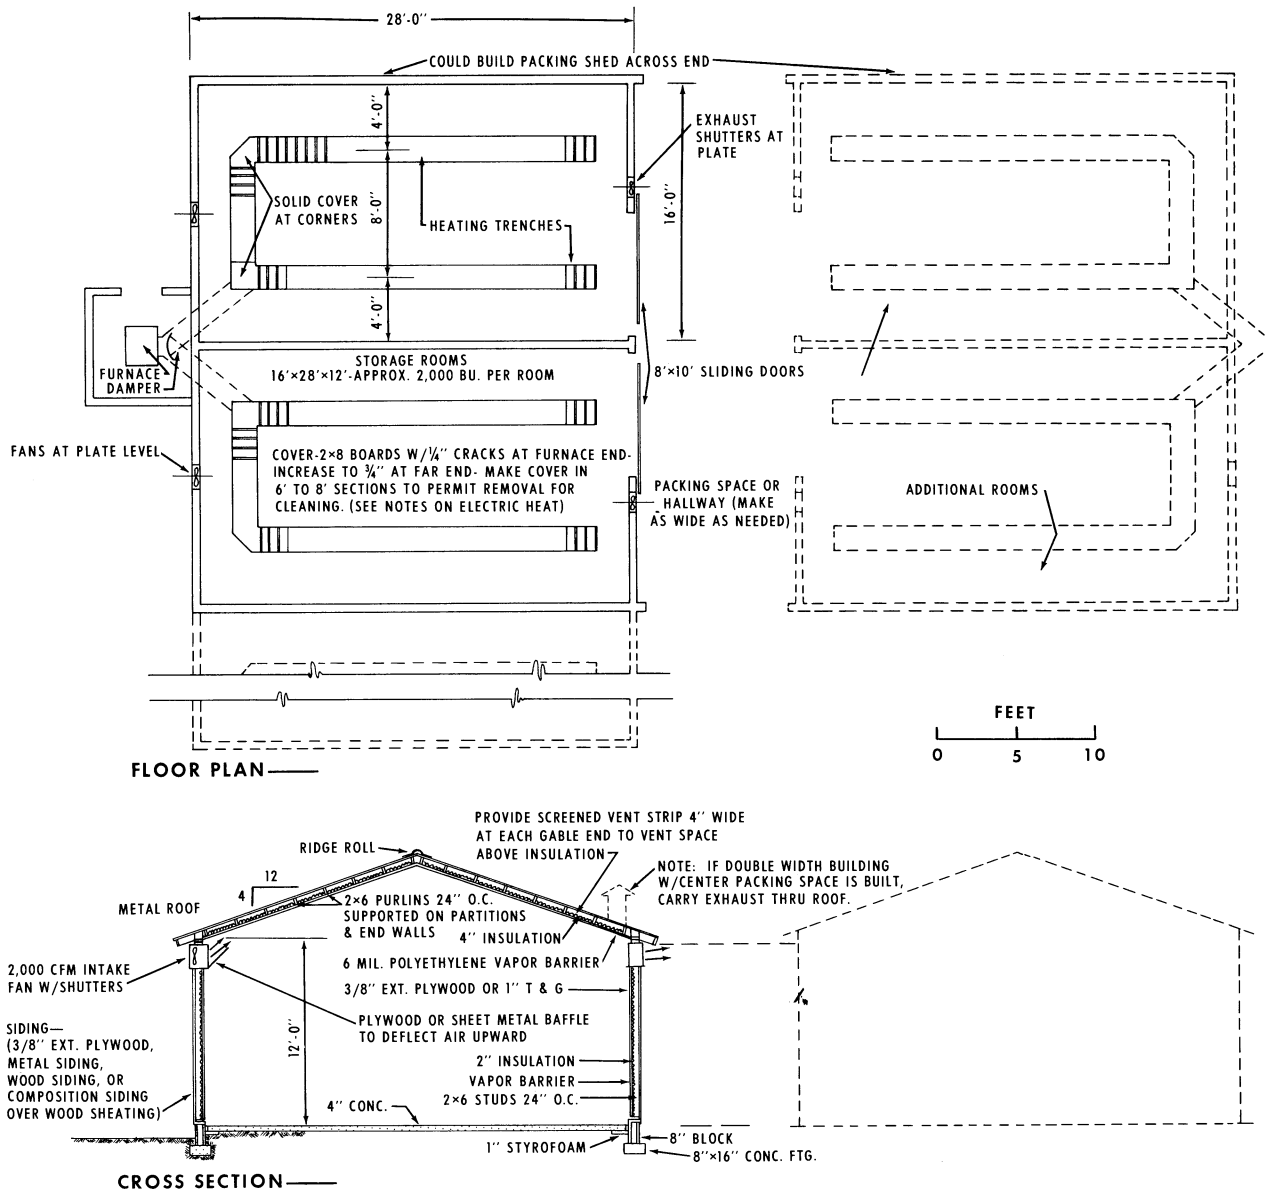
Schematic floor plan for a storage composed of several rooms. Room size may be changed to meet needs, but four or more rooms are recommended for this type of storage. (Courtesy R. Ritchie, Dept. Biol. and Agr. Engin., N.C. State Univ.)
